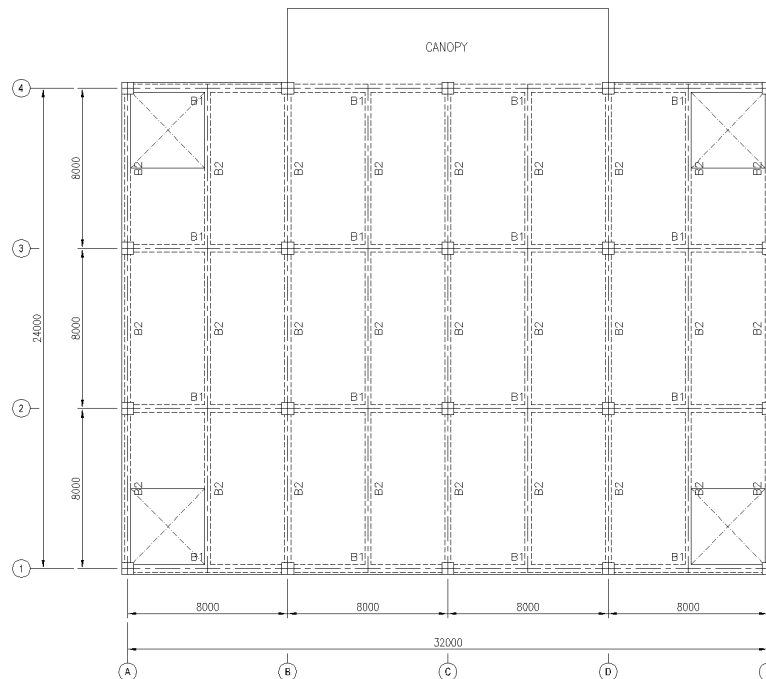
Structural layout of the analyzed continuous slab-beam system and typical span arrangement.
